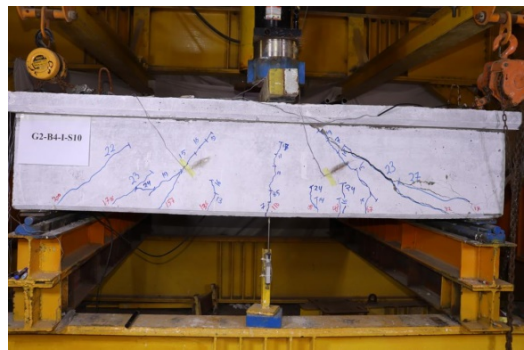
Failure crack pattern of specimen G2-B4-I-S10.
